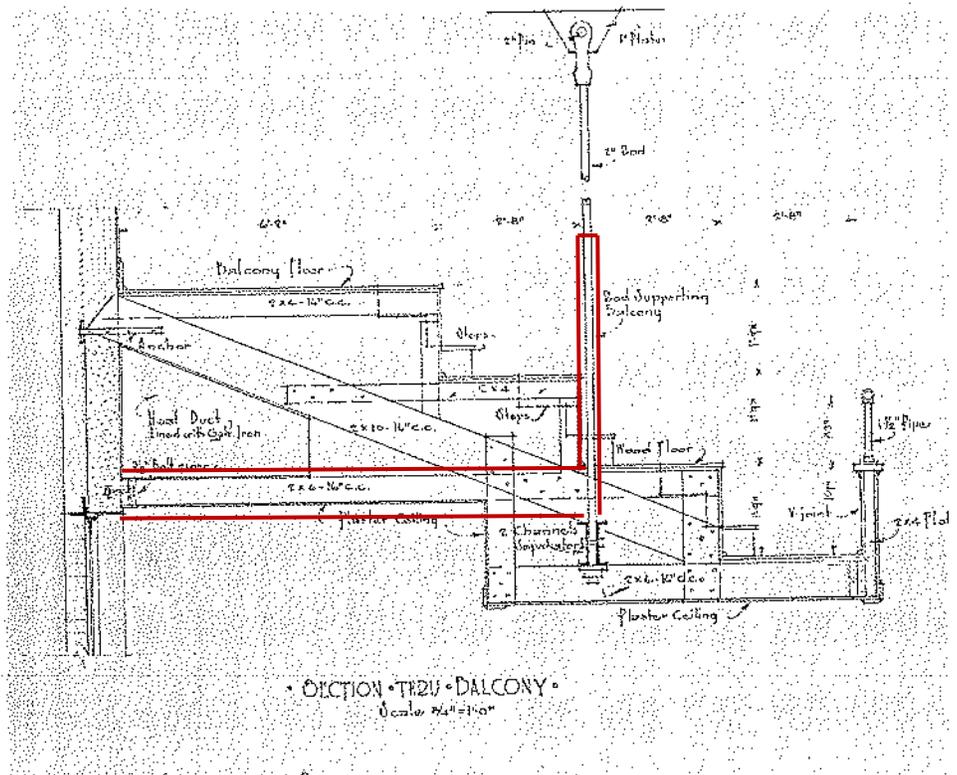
Red lines of existing balcony superimposed over cross-section of balcony detailed on the 1921 construction documents.
